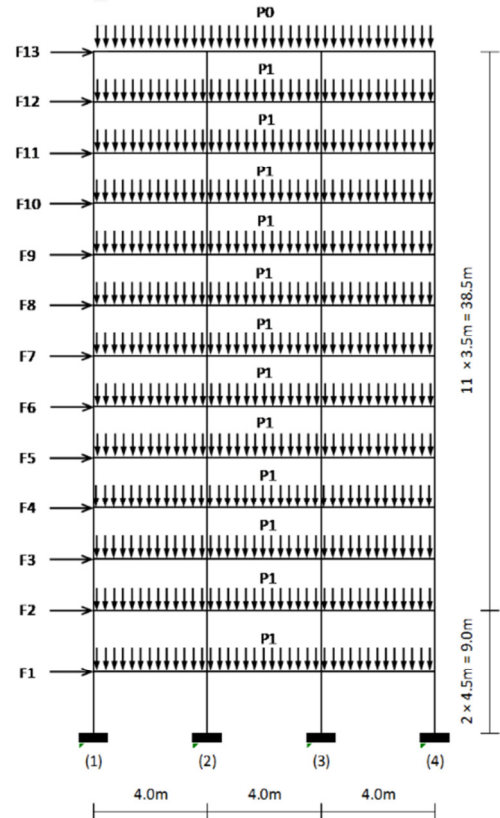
Elevation of the 13-story steel frame subjected to both horizontal and vertical loads.
